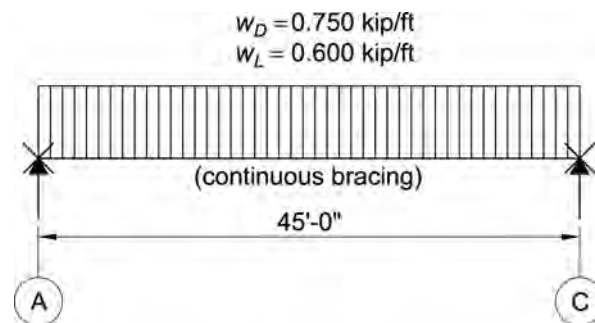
Loading and bracing diagram for typical interior composite floor beams.
